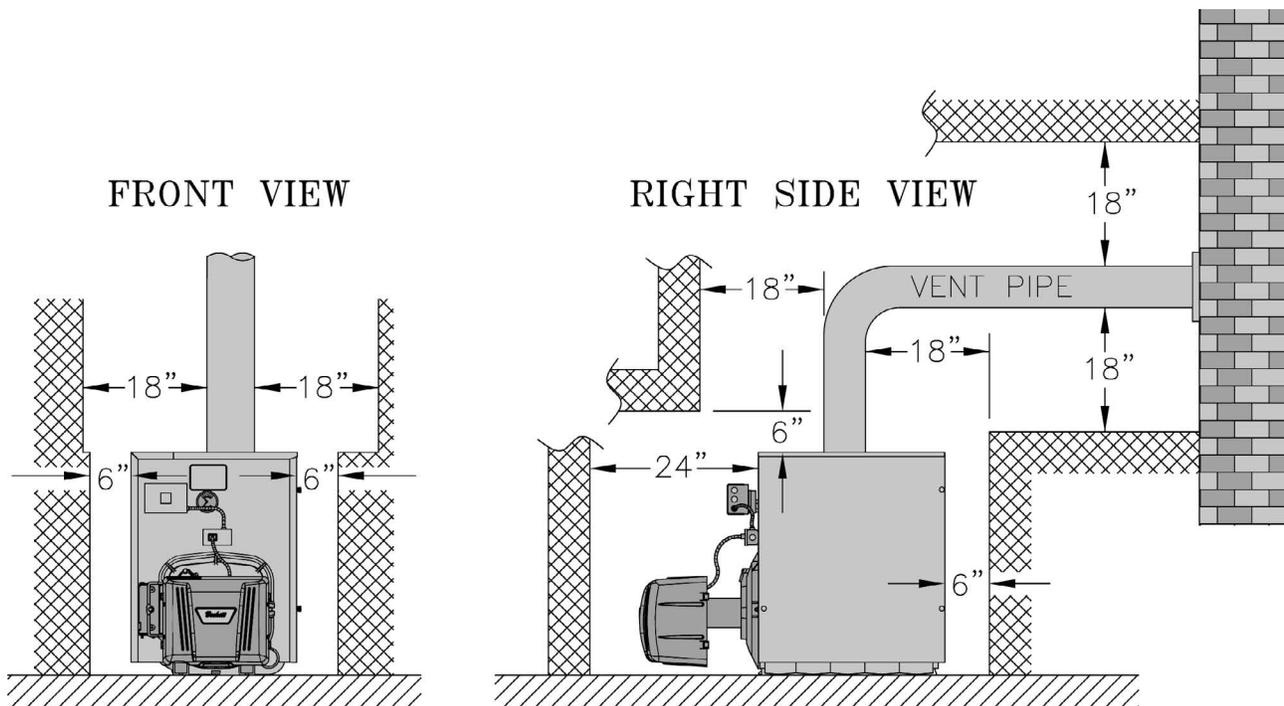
Minimum Installation Clearances To Combustible Materials (Inches)
